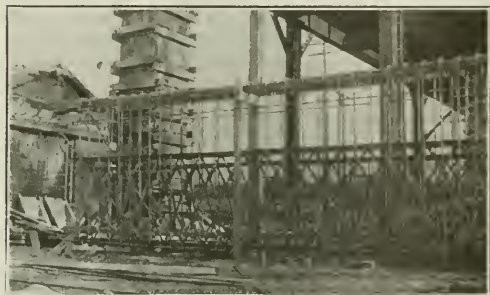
CROSS-GIRDER REINFORCEMENT ASSEMBLED ON GROUND
